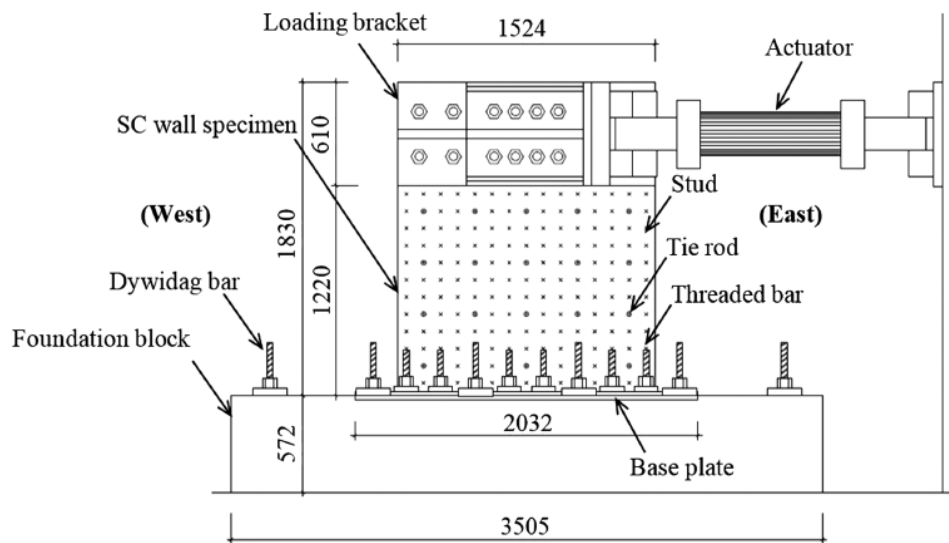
steel-plate composite wall test setup, Figure from Epackachi et al. (2015).
